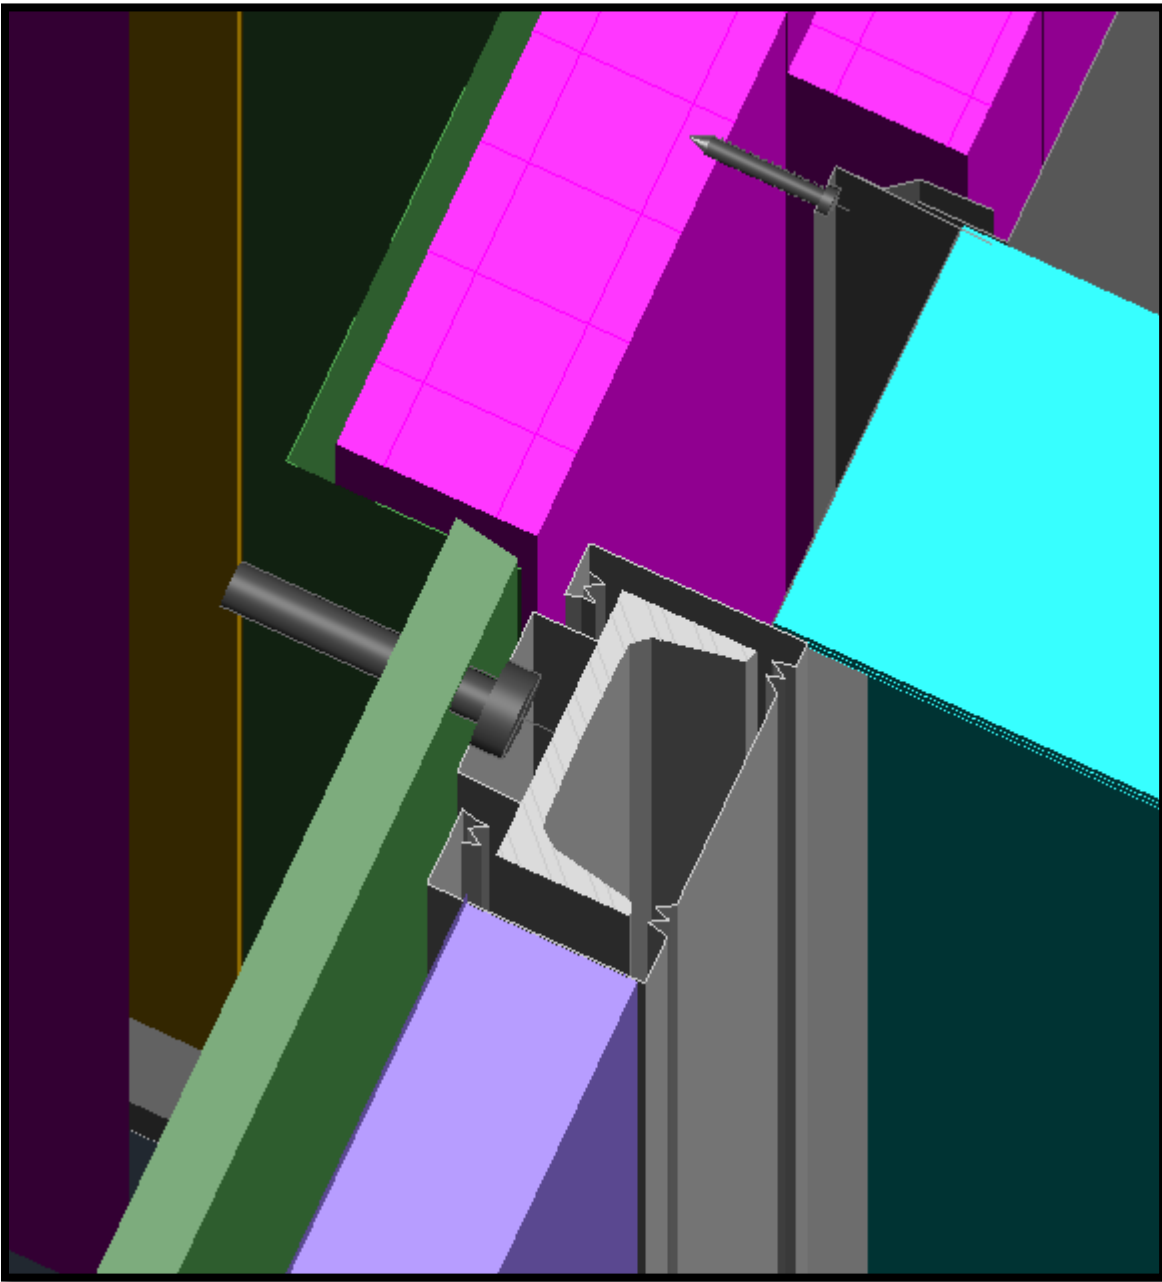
This image shows a closer look of Figure 6-8. It shows how the metal panels and their structural supports, glazing, insulation, water proofing, and gypsum board are connected to the concrete wall.
